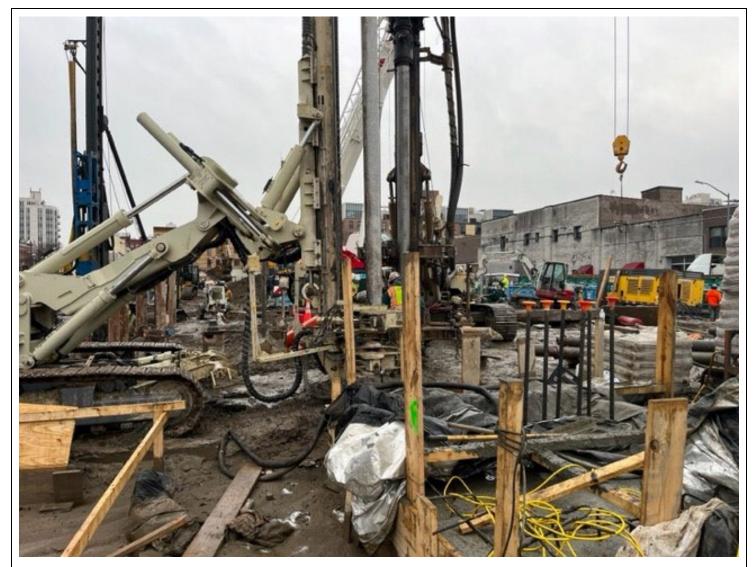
View facing south, CCJV installing rebar inside caisson in grid cell SC-4
